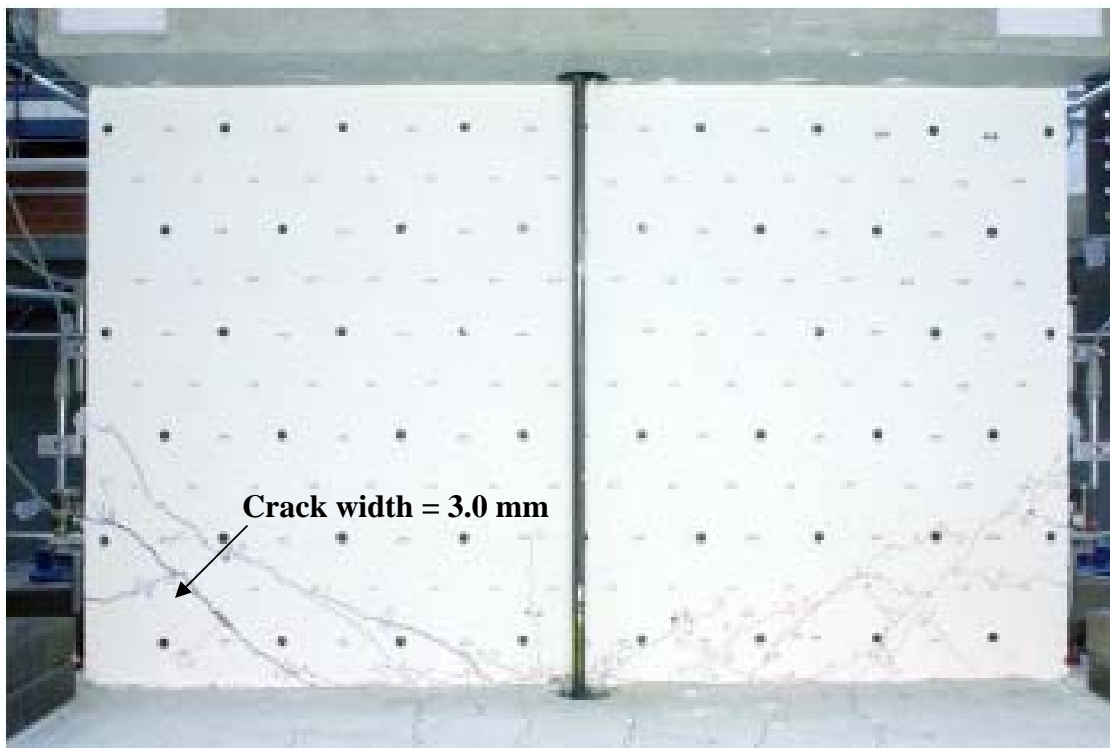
Cracking pattern for wall M2 tested by Greifenhagen et al. (2005) at a maximum flexural crack width of 3.0 mm
